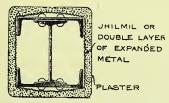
Steel Stanchion covered with Jhilmil, or Expanded Metal, and Plaster.
